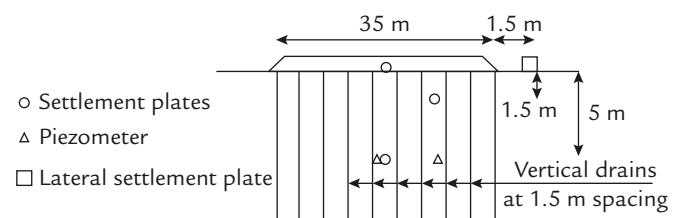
Embankment cross section and locations of instrumentation at Skå-Edeby, Sweden (Indraratna et al. 2007).
